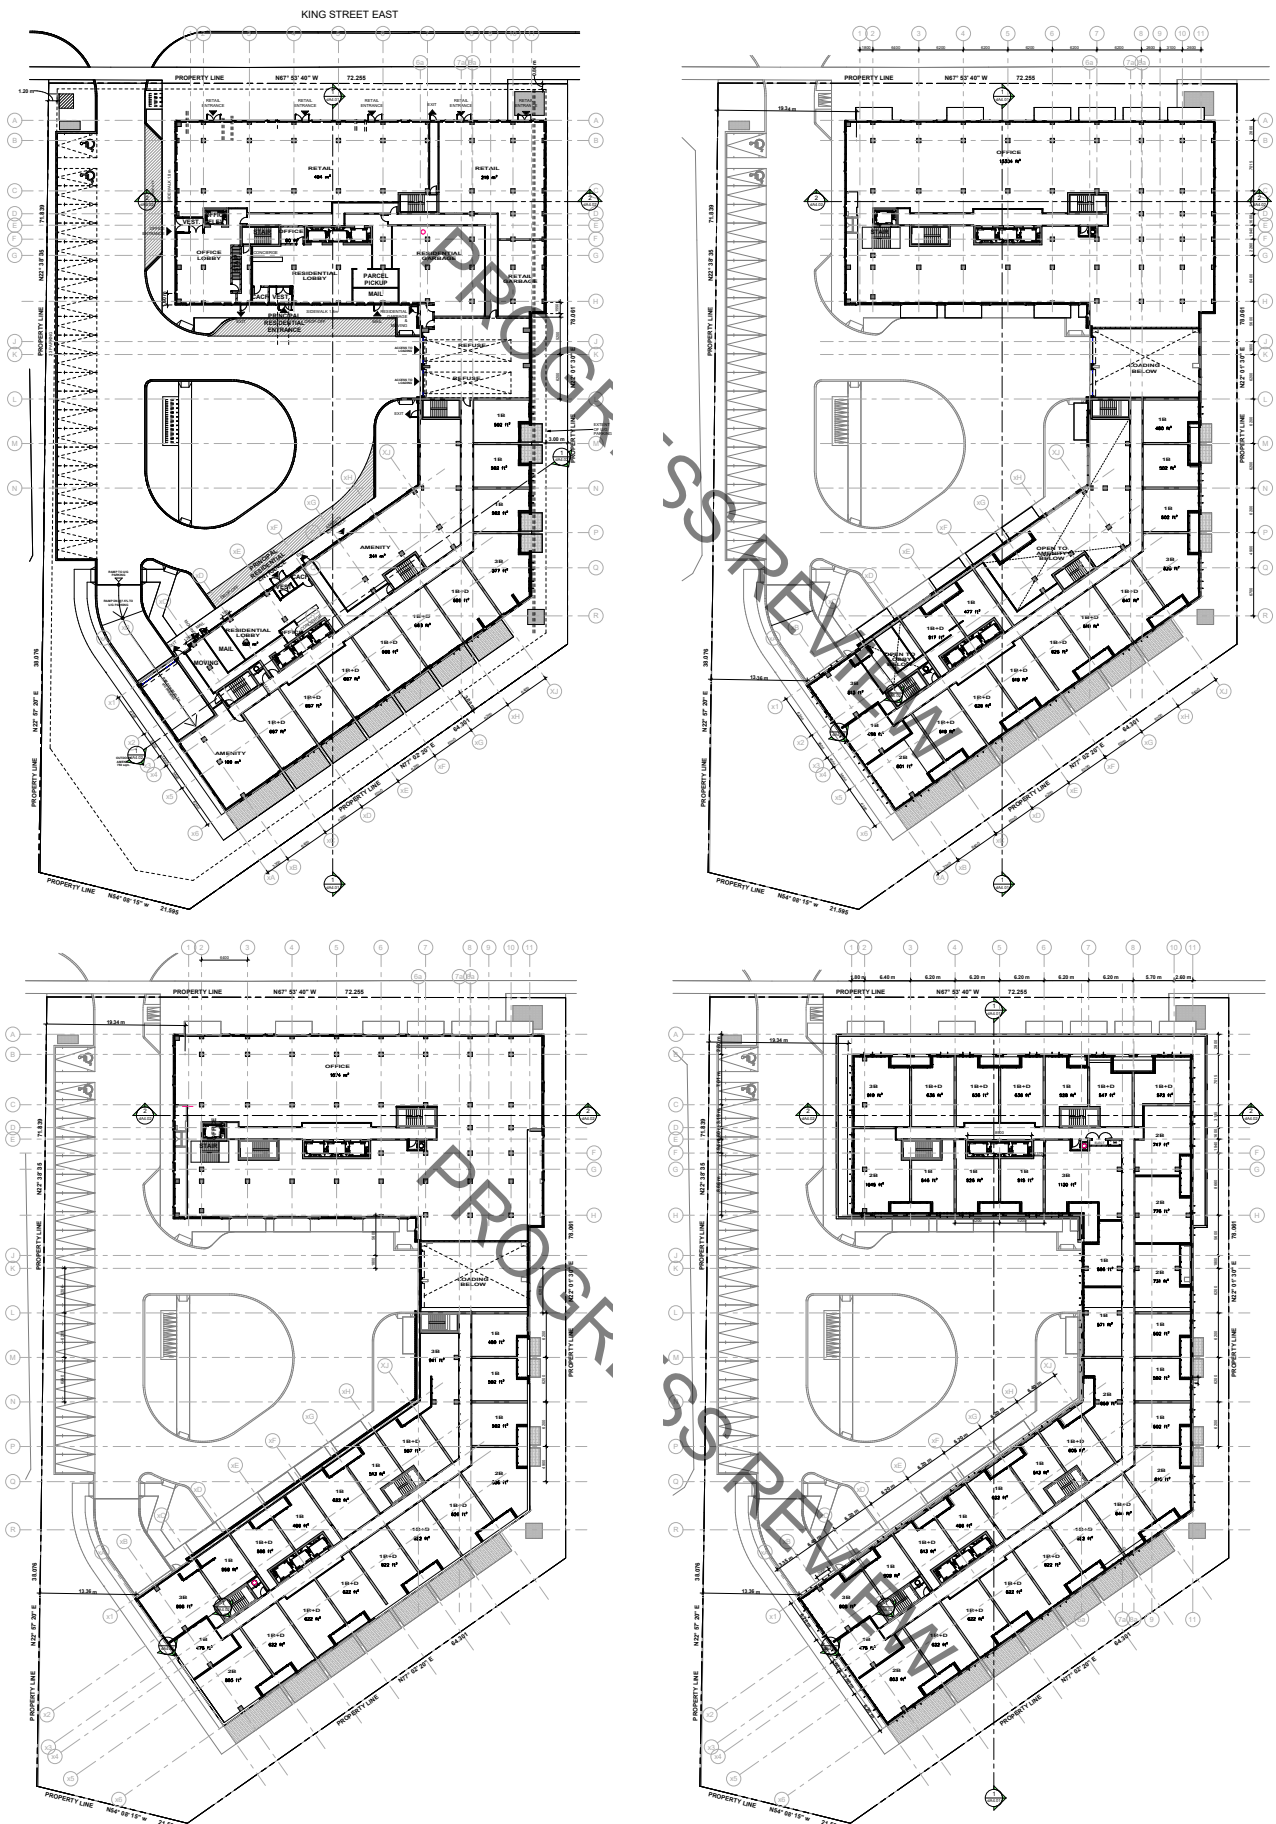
Floor Plans prepared by Kirkor Architects and Planners
